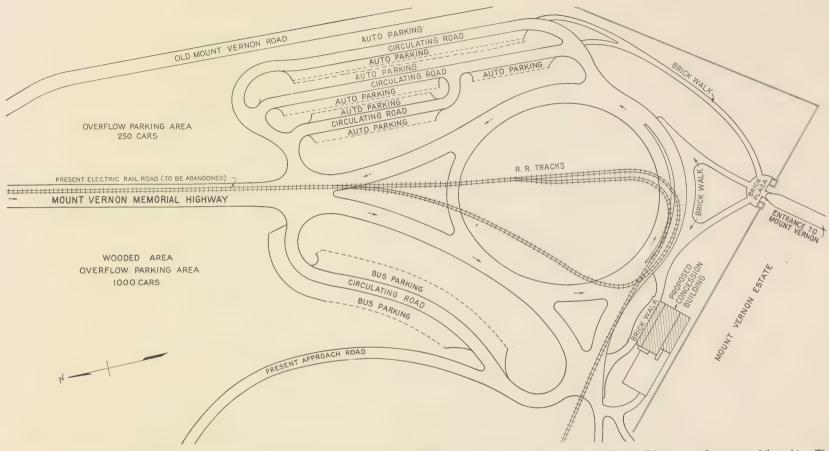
Treatment of the Mount Vernon terminus to the project and the parking facilities provided for automobiles and buses. Bus parking will be separate from automobile parking. The construction outlined in this layout will provide parking facilities for 350 passenger automobiles and approximately 60 buses. It is estimated that these parking facilities will be ample to meet all ordinary requirements. Title is being taken to a sufficient area of land, so that overflow parking to the extent of 1,500 or more vehicles can be accommodated by utilizing the natural ground surface, which would be made available by a small amount of selective cutting
